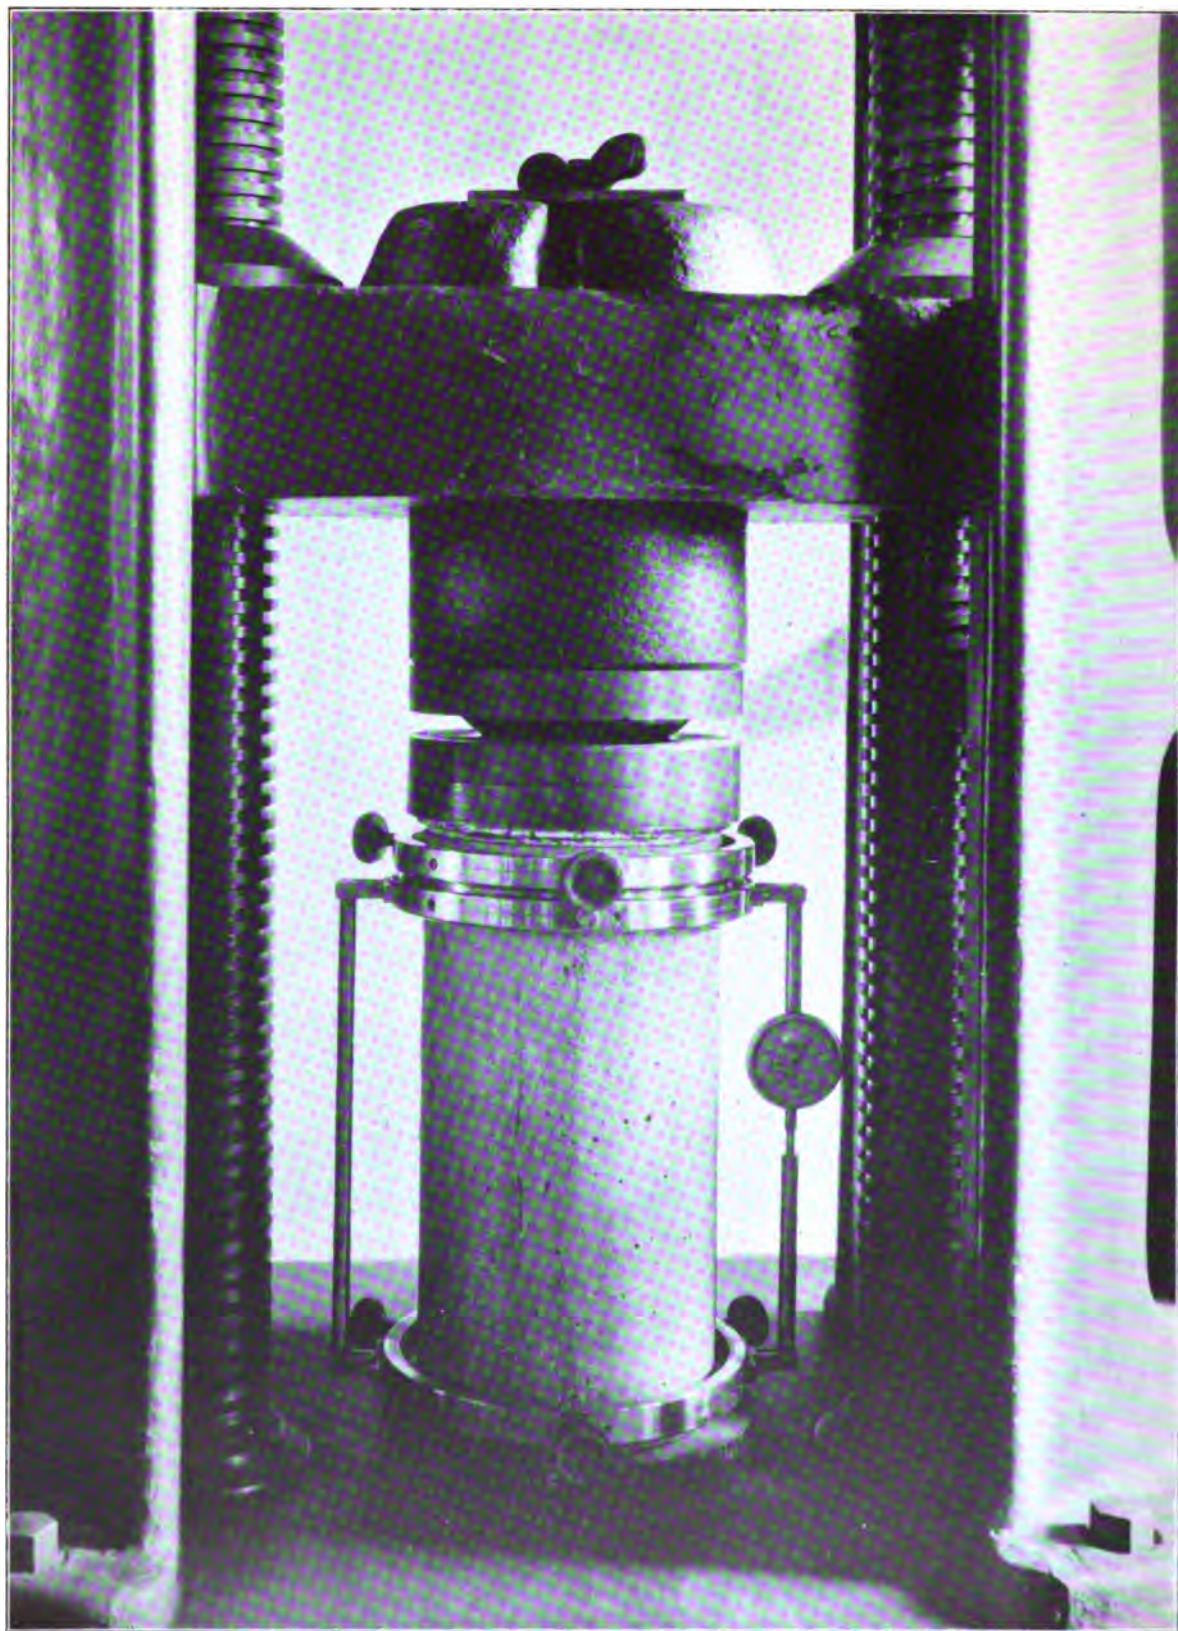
Cylinder in testing machine showing compressometer attached to specimen
